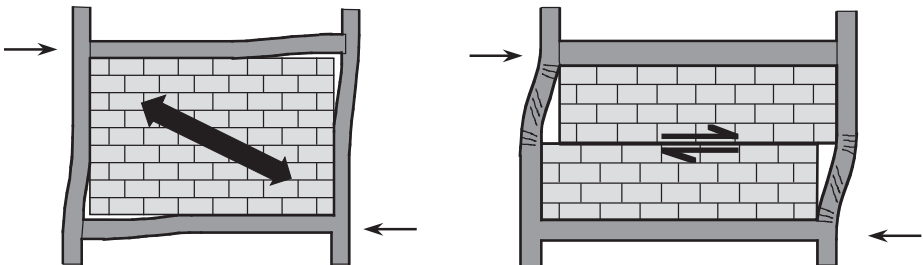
Damages to R.C. frame due to masonry infill wall
